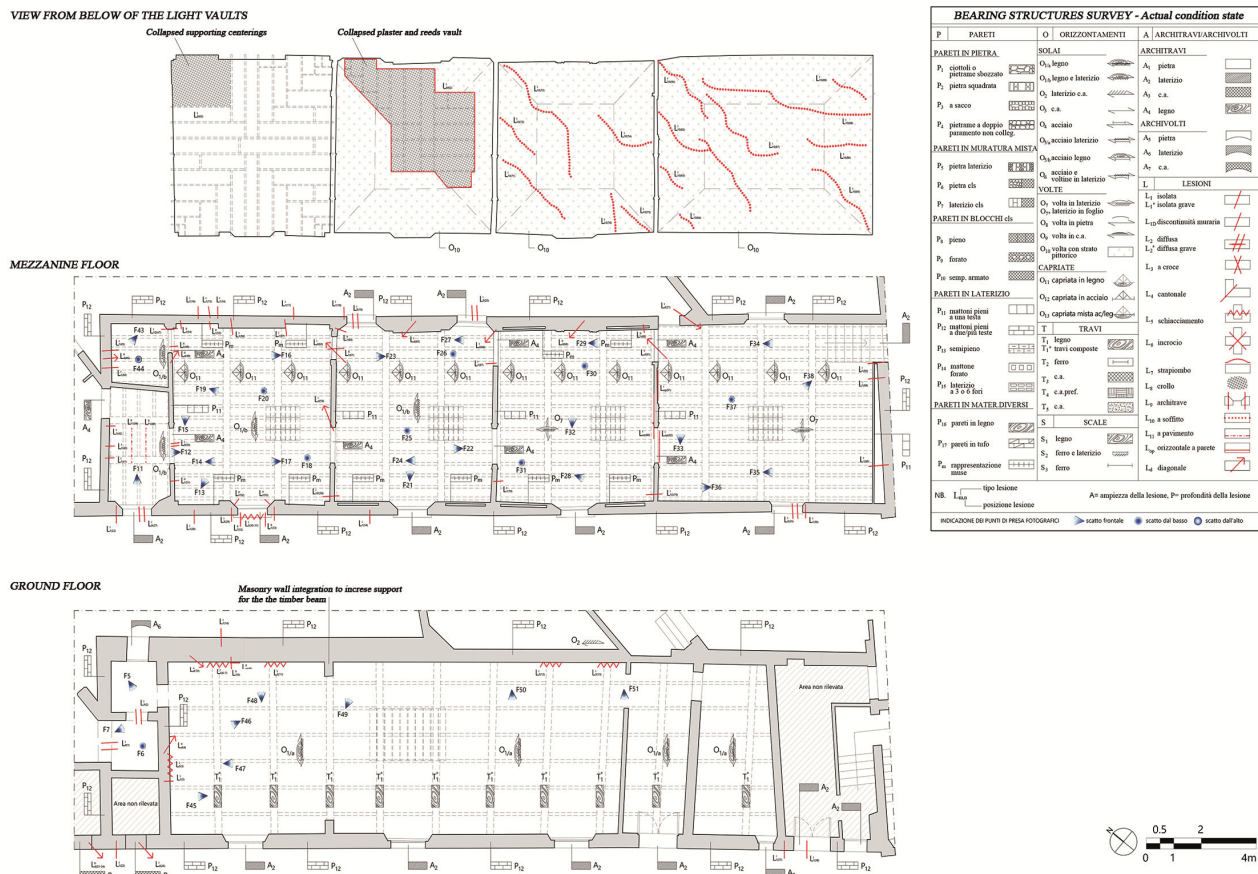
Sale delle Sibille minimum unit of intervention, the bearing structures survey and the crack pattern assessment.
